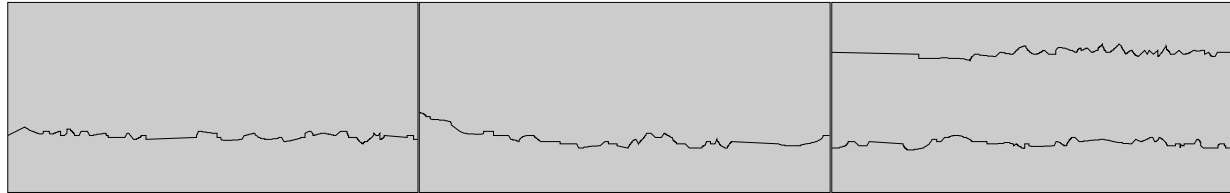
Schematic of typical longitudinal cracks in rigid pavements.
